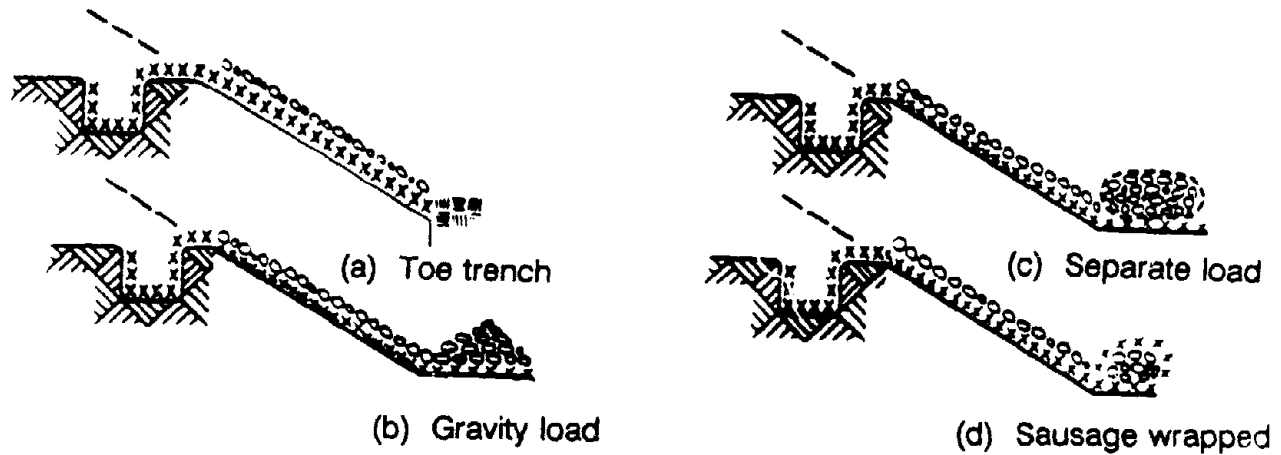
Anchoring methods for geotextiles at toe of slope or embankment.⁽¹⁾
